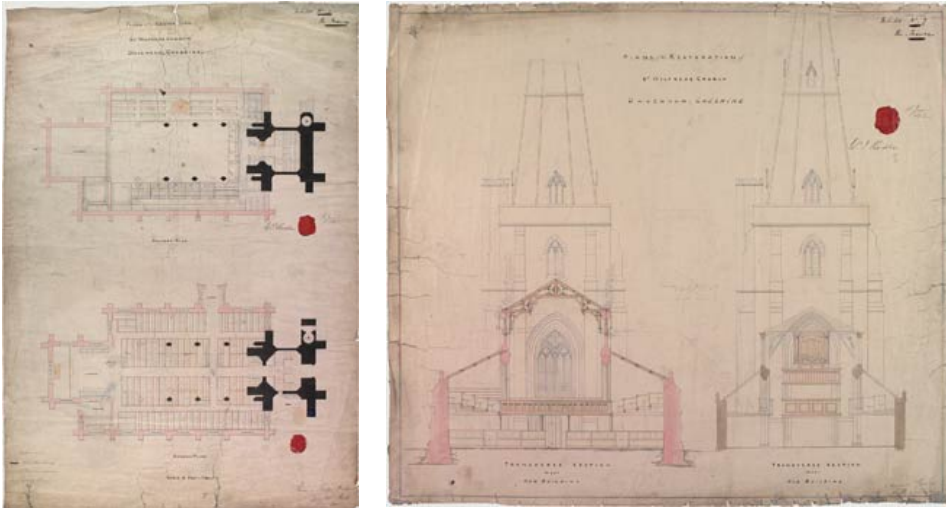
and 6.2 Incorporated Church Building Societies existing and proposed plan and section of St Wilfred, Davenham
